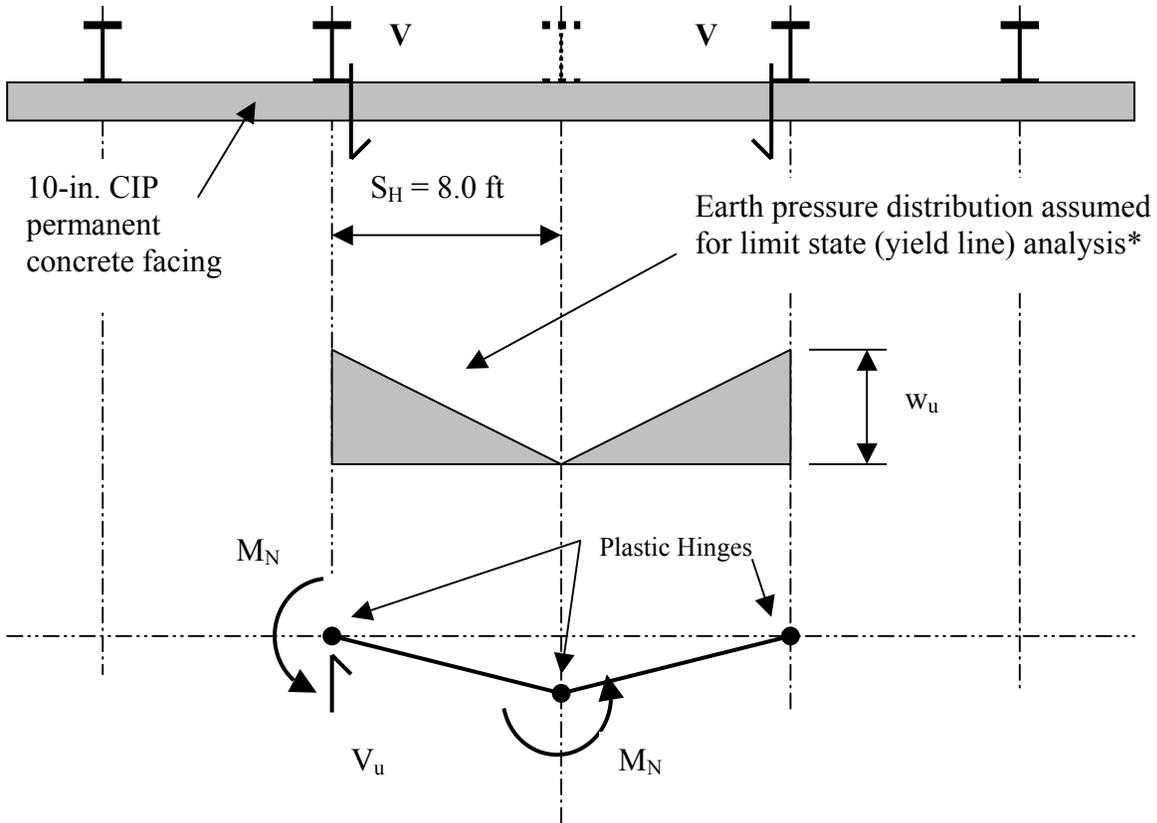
Soldier beams with concrete facing—elevation view; yield line analysis example
